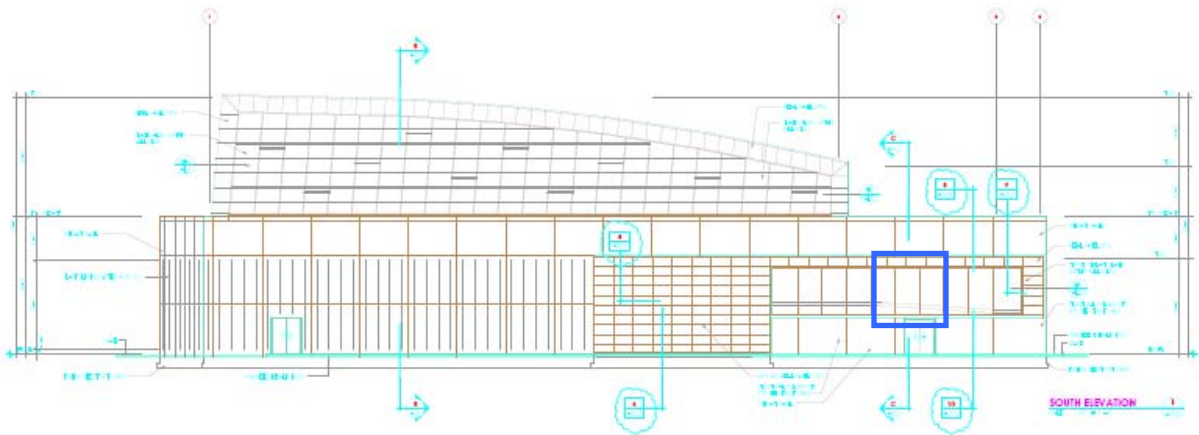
Elevation of South Façade of Natatorium Showing Glass Panel Used for Second Glass Calculations
